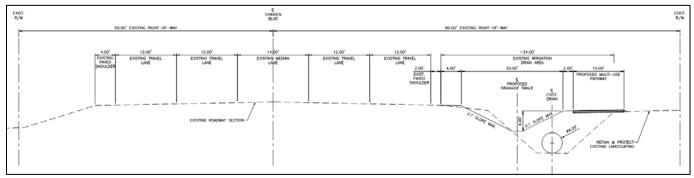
Alternative #2 and #3, Segment 1 Typical Section
